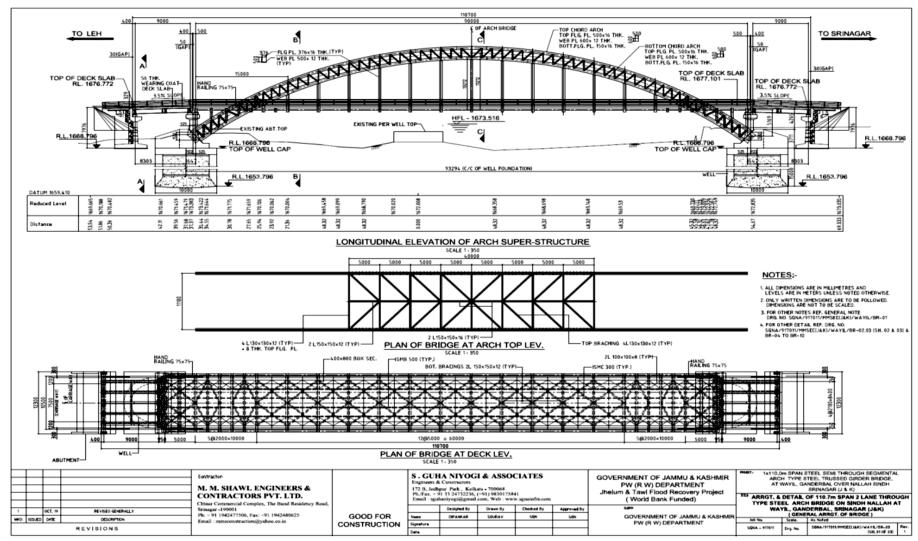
General Arrangement Drawing (GAD) of the Proposed Construction 1x110.7 meter Bridge on River Sindh at Wayil in District Ganderbal
